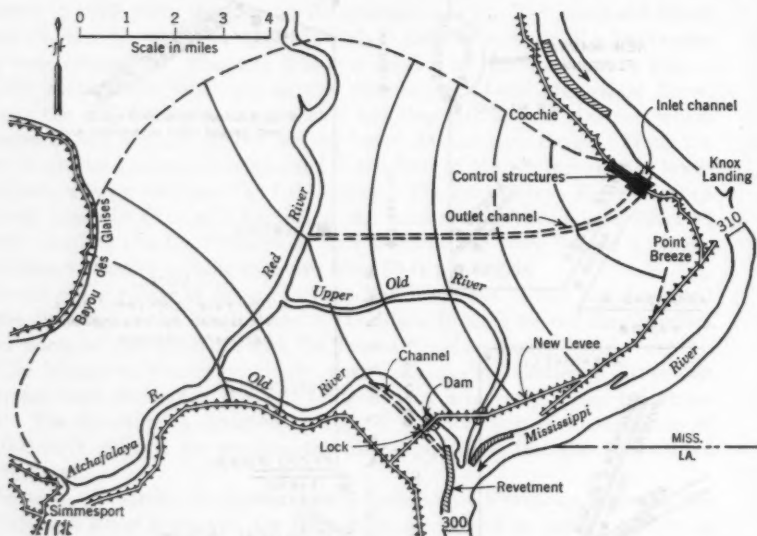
GENERAL LAYOUT OF PLAN AND FLOW DIAGRAM
